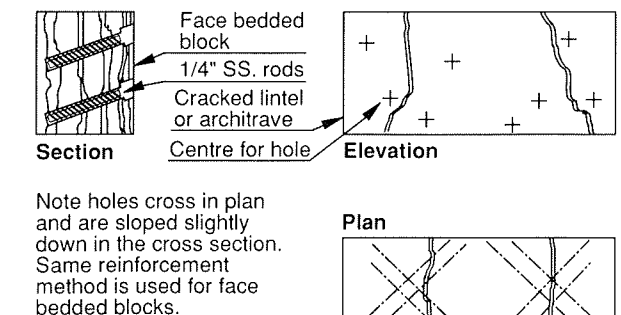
Repair of cracked stone lintels and architraves.
